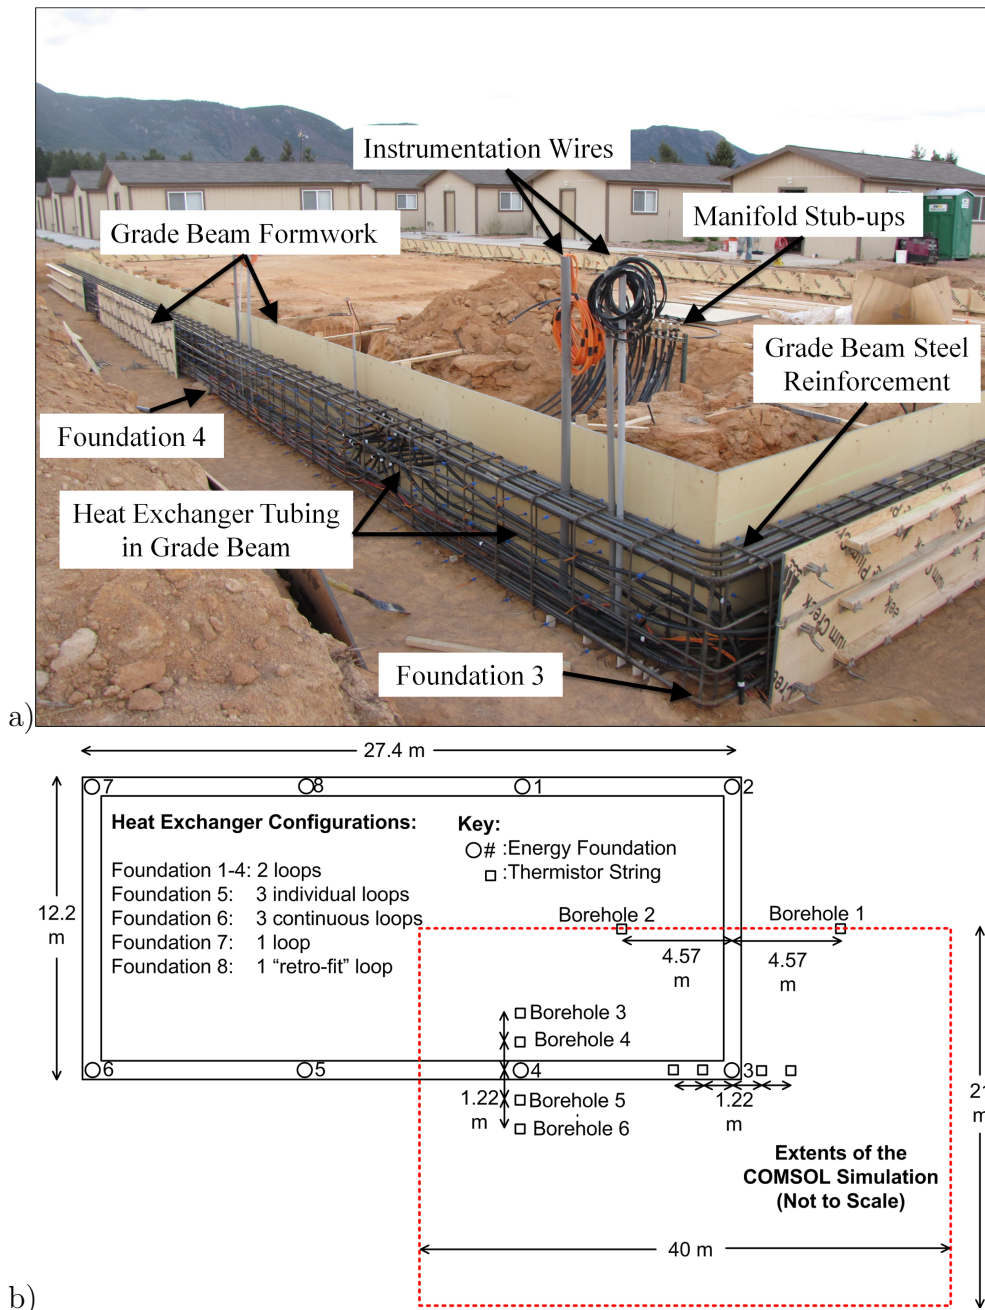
USAFA experimental pile group a) construction picture b) plan view (Murphy et al., 2015)
